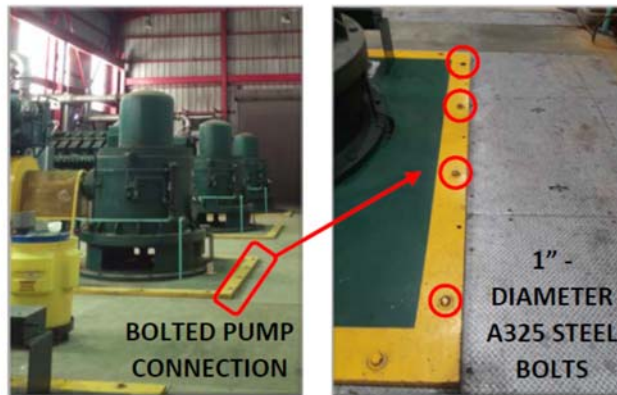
Bolted Connection between Pump Equipment and Pumphouse Floor
